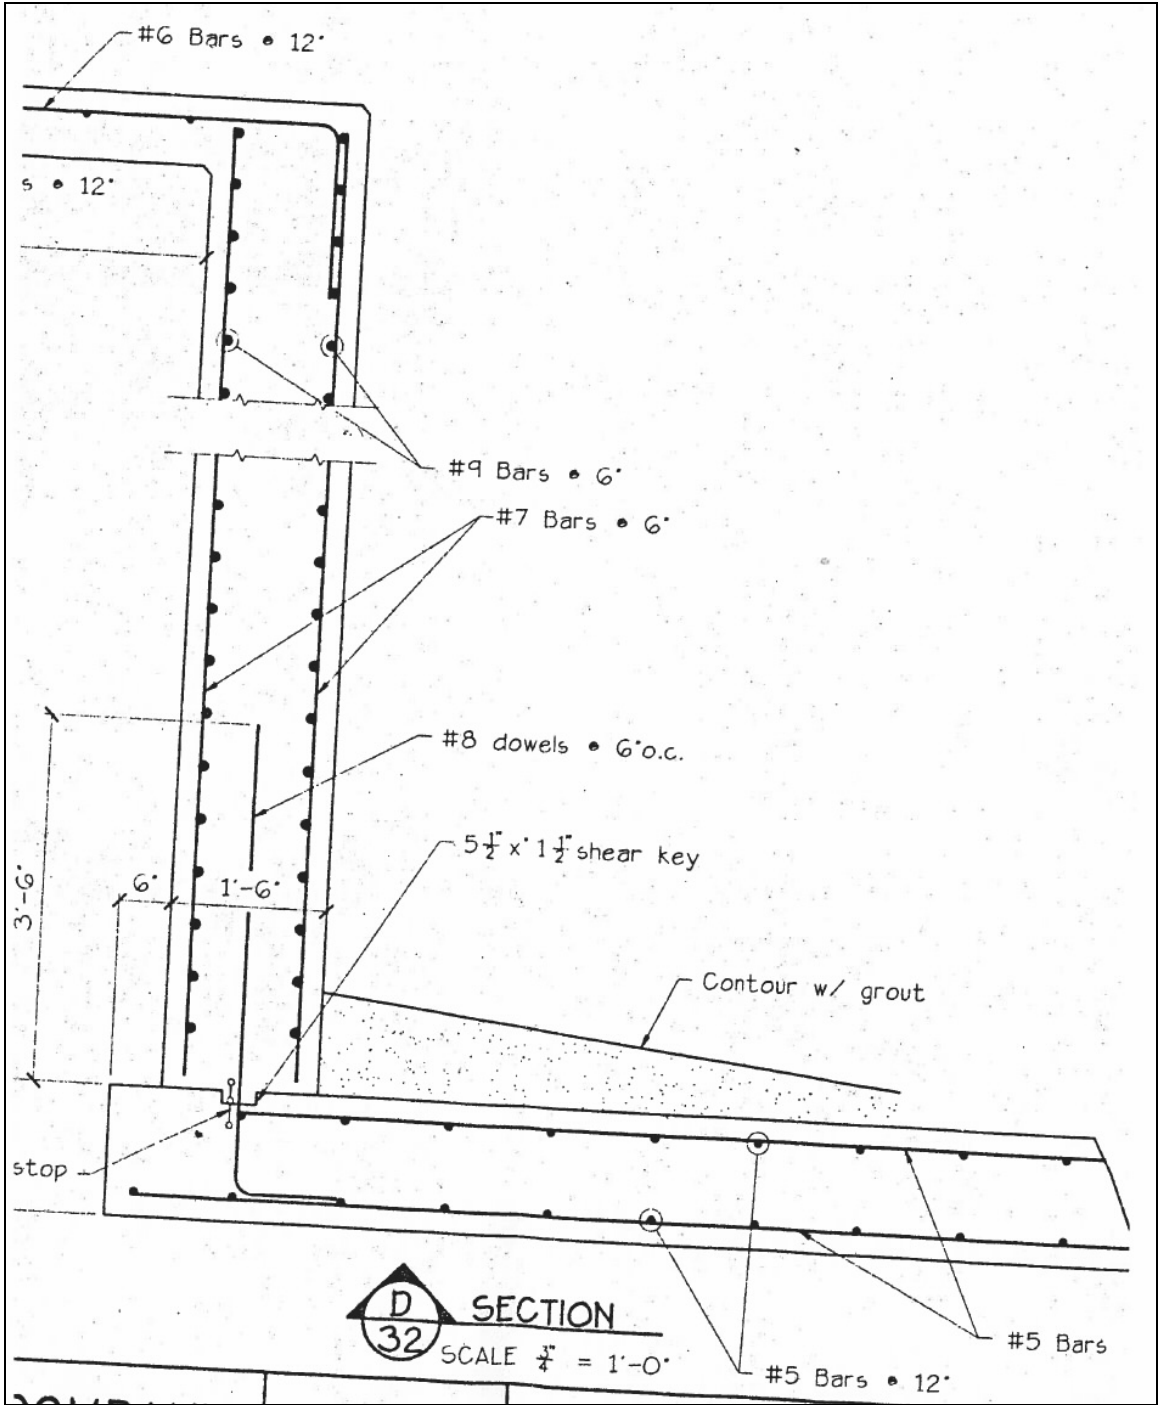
Vertical Section Showing Reinforcement for North Wall
